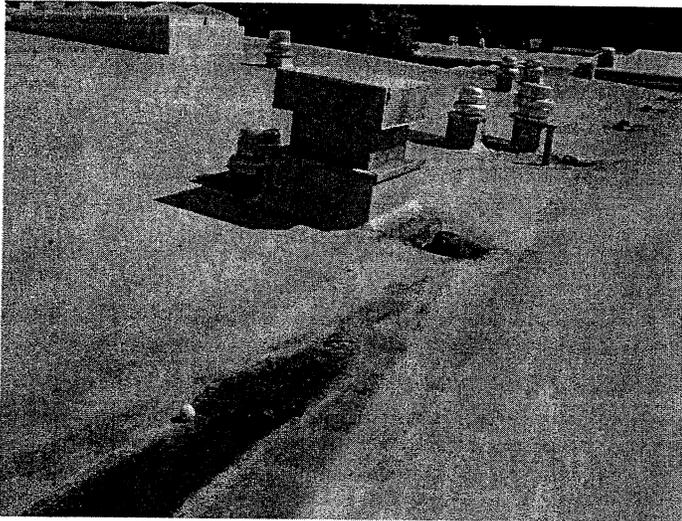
Improved drainage, particularly in valley areas, needs to be a priority in the new roof design. At present, large amounts of water collect between roof drains. Tapered insulation will resolve most drainage issues.
